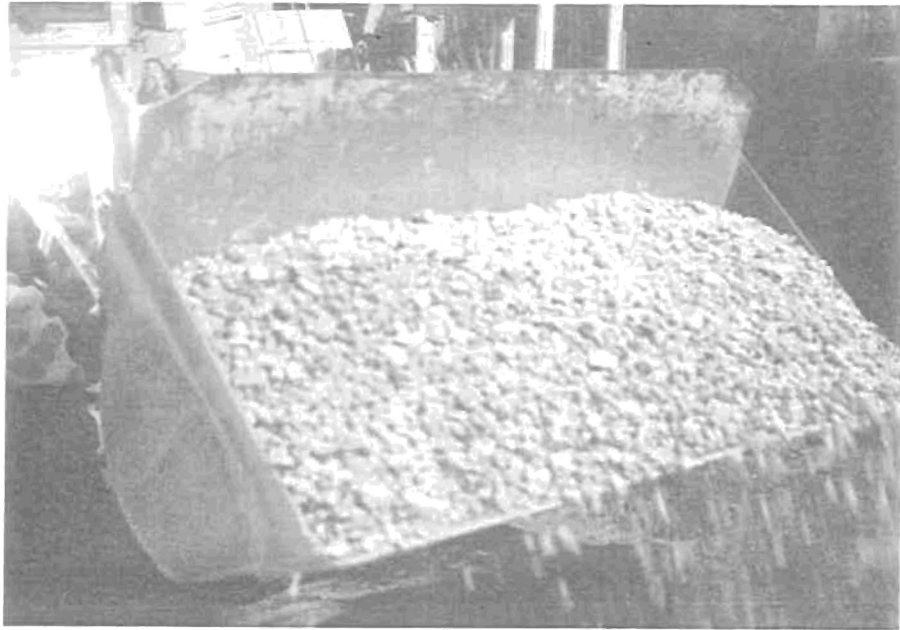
A granular filter material was placed in the excavated area for a base before placing the manhole.
